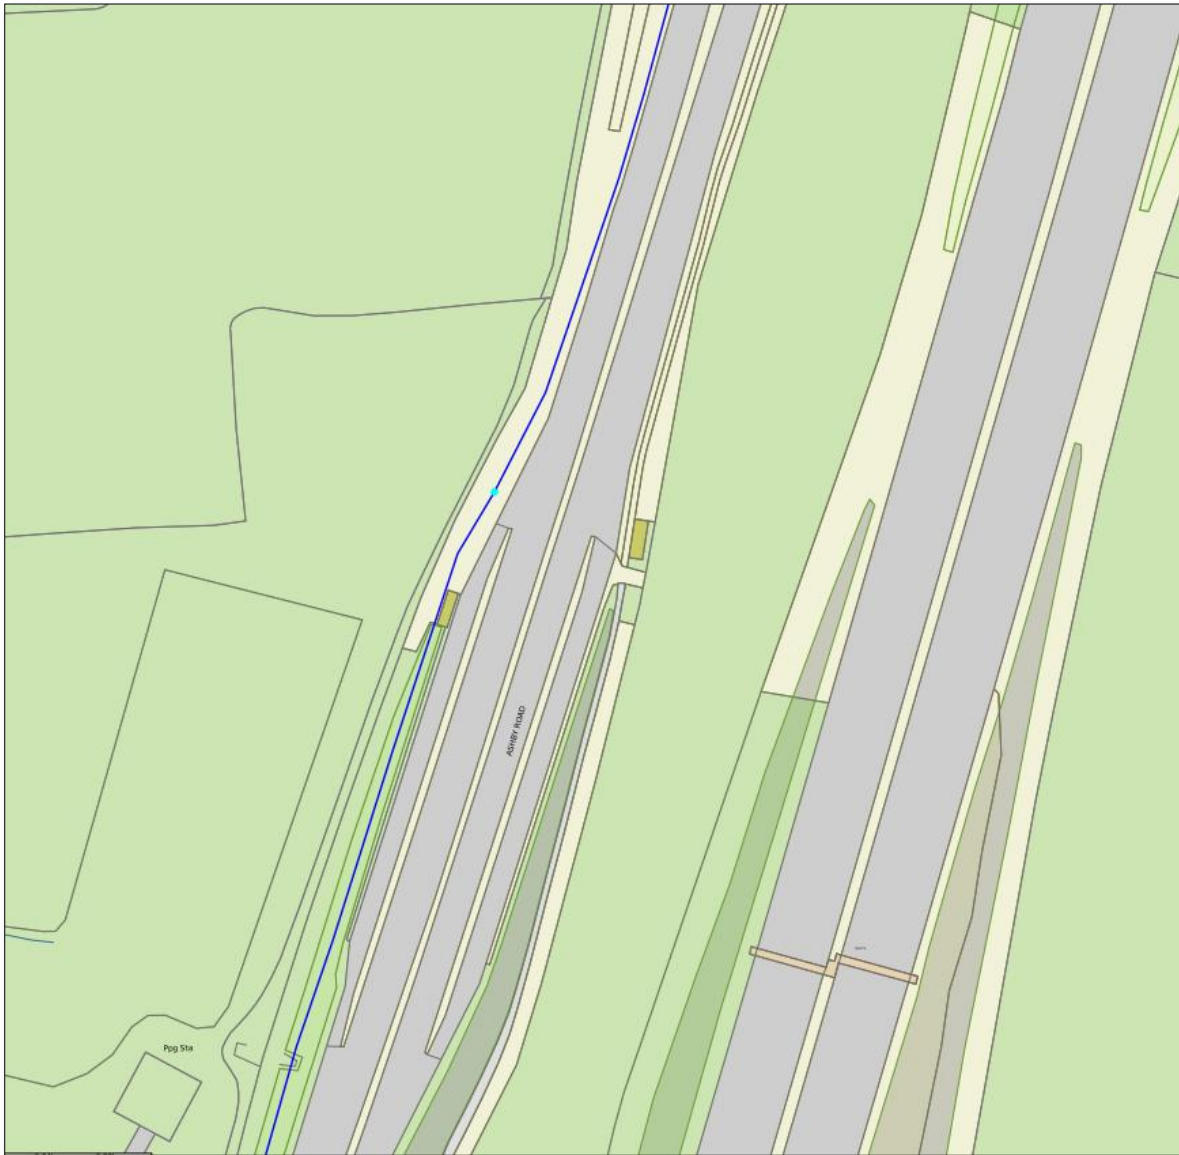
Existing underground chambers and ducts to the west of the A45
